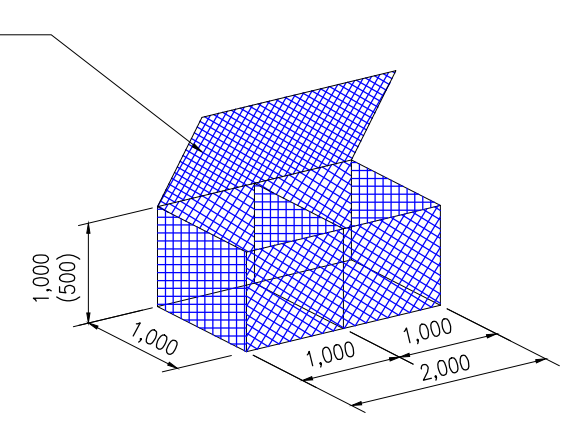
DETAILS OF SAND BREAK FOR SLOPE STABILIZATION
